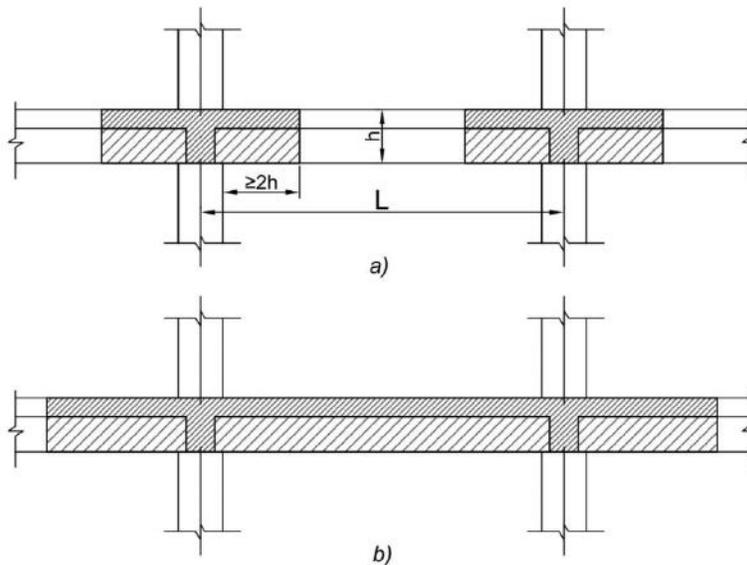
Different configurations of RC beam jackets: a) partial jacketing and b) continuous jacketing.
